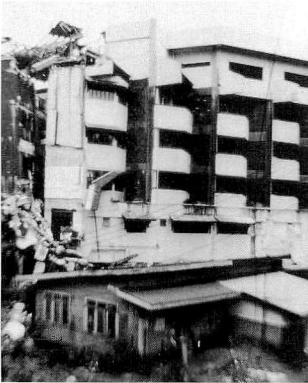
(g) University of BAGUIO College of Commerce Smaller buildings at Surroundings are negligibly or partially damaged.
